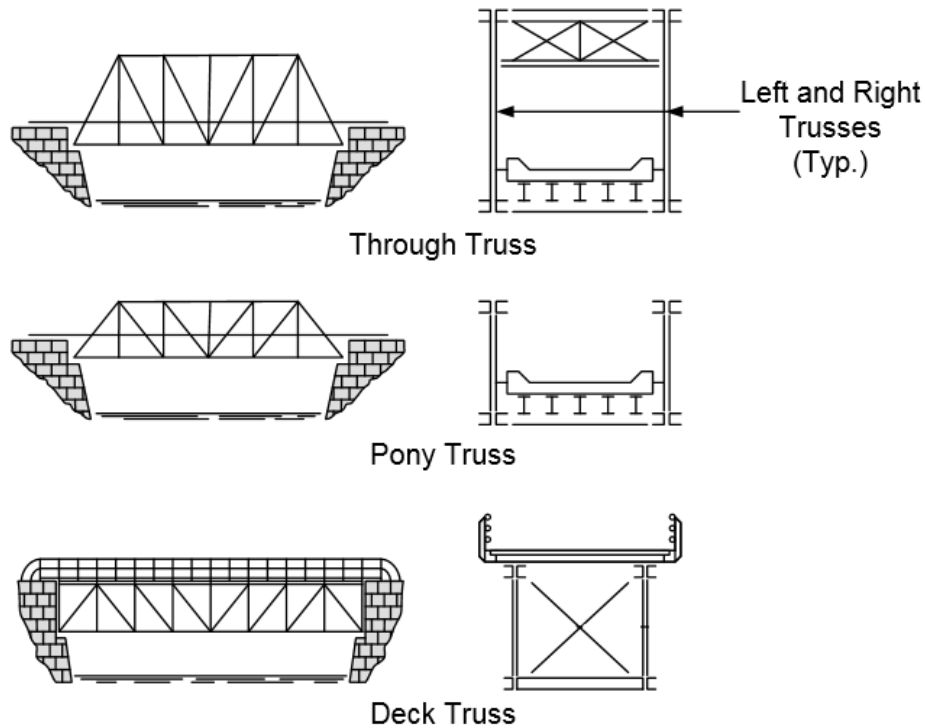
Through, Pony, Deck Truss Comparison
